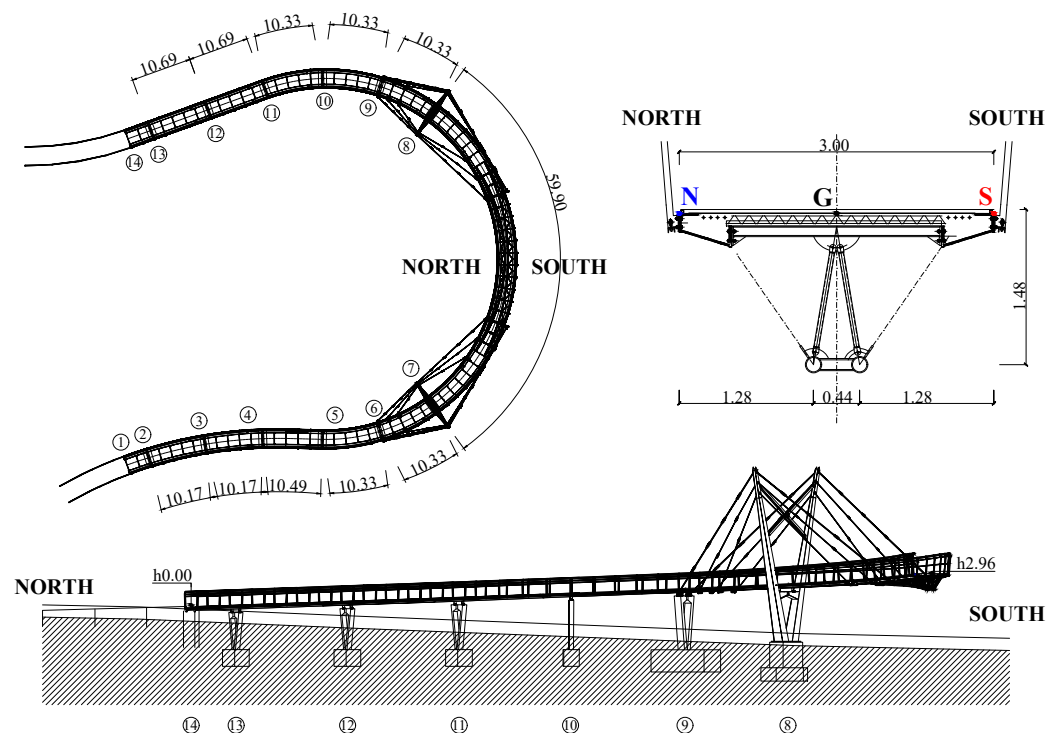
Pasternak footbridge: plan, half-elevation, and typical cross-section (all dimensions in metres). The span supports are numbered sequentially from 1 to 14, from west to east.
